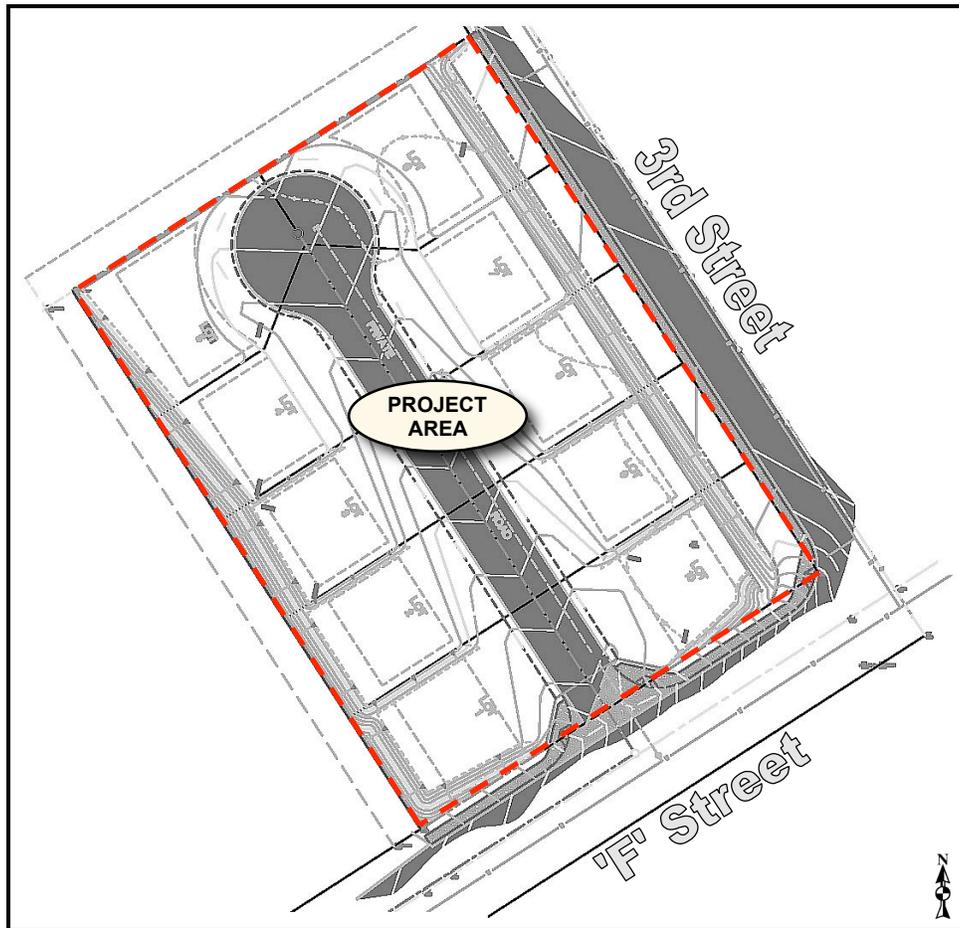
Proposed Site Plan – Ramona 10-Lot Subdivision (Snipes-Dye Associates 1/07)
